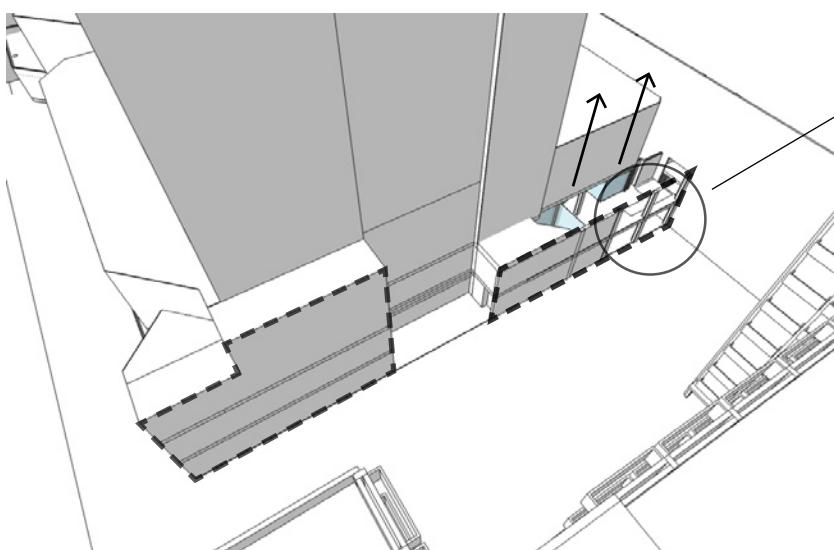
Remove brick in-fill and existing corrugated steel roof.
